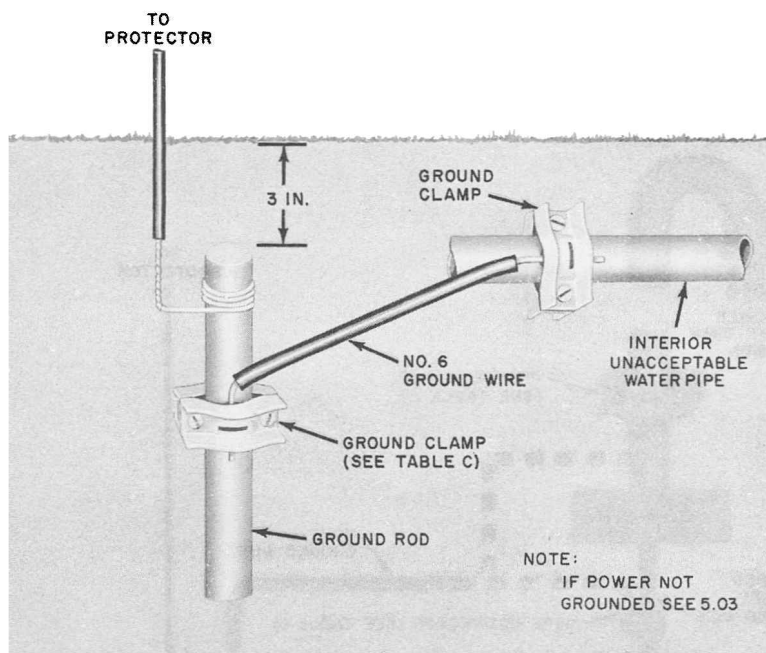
Power Not Grounded on Premises—Unacceptable Interior Water Pipe
